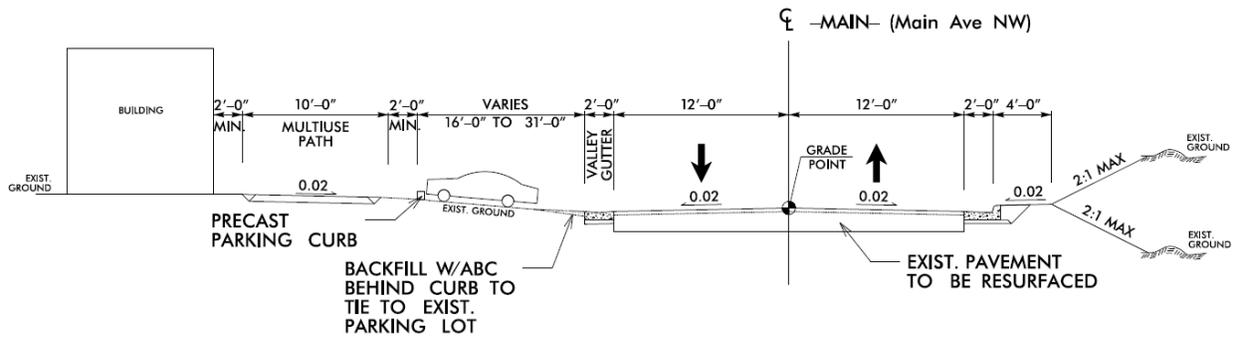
Applicant provided cut section of the pathway and improvements planned near Piedmont Wagon. *Note the proximity of the path to the building, car parking, and roadway.
